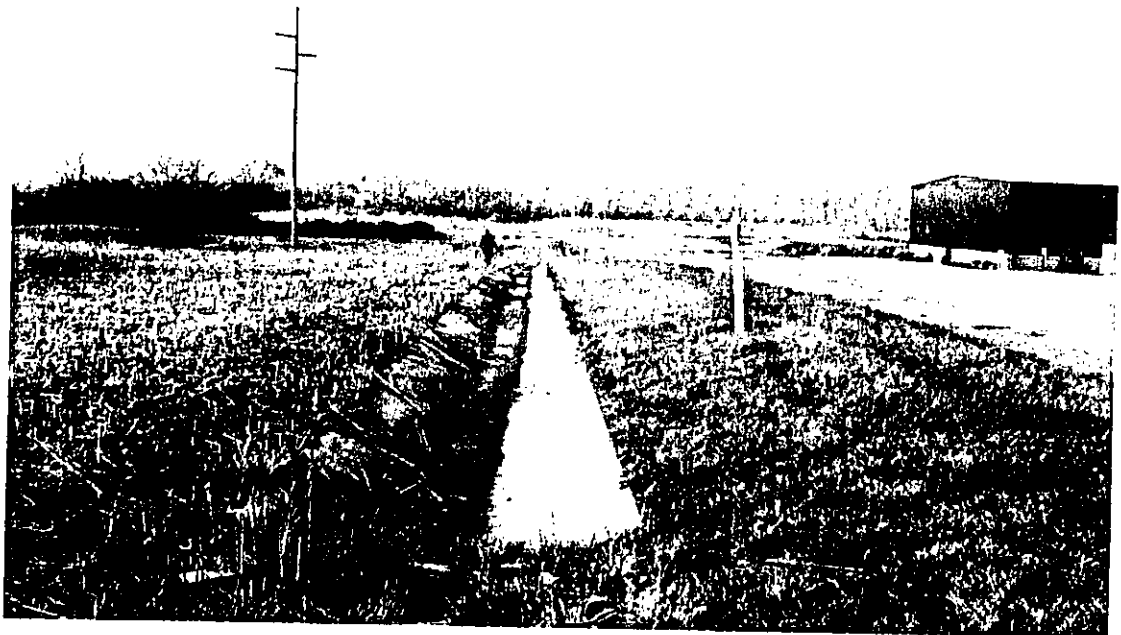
View of Proposed Route along Bohkle Boulevard, facing northwest.
